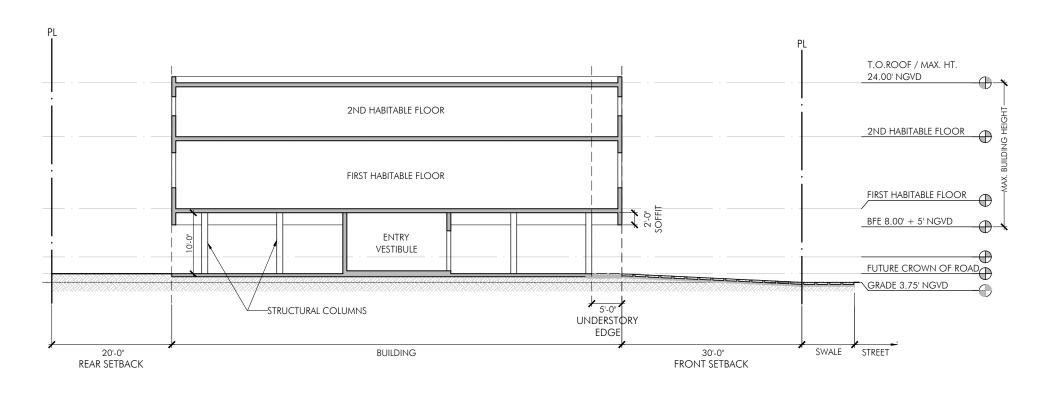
EXHIBIT C: EXISTING CODE 60' LOT (SITE PLAN)
